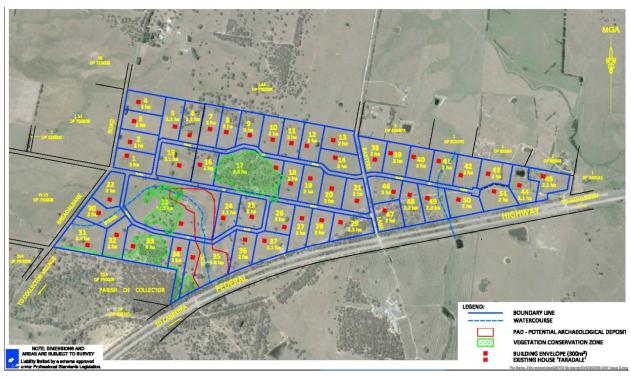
Proposed future subdivision road system (Source: LandTeam Australia Proposed Subdivision Plan)
